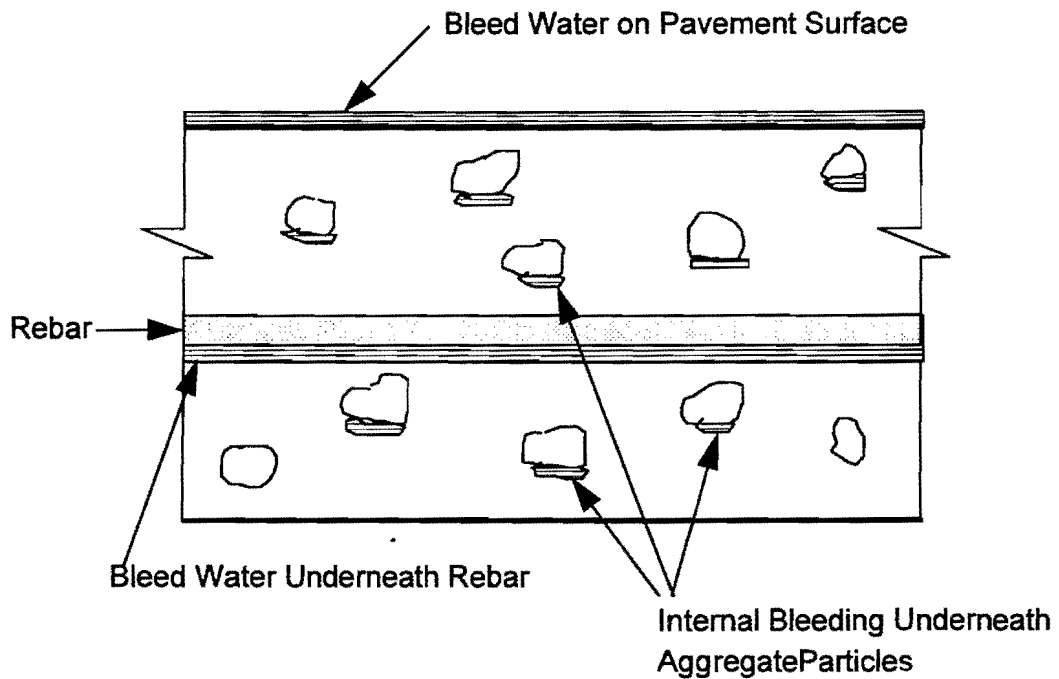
Different Types of Bleeding in a Concrete Pavement
